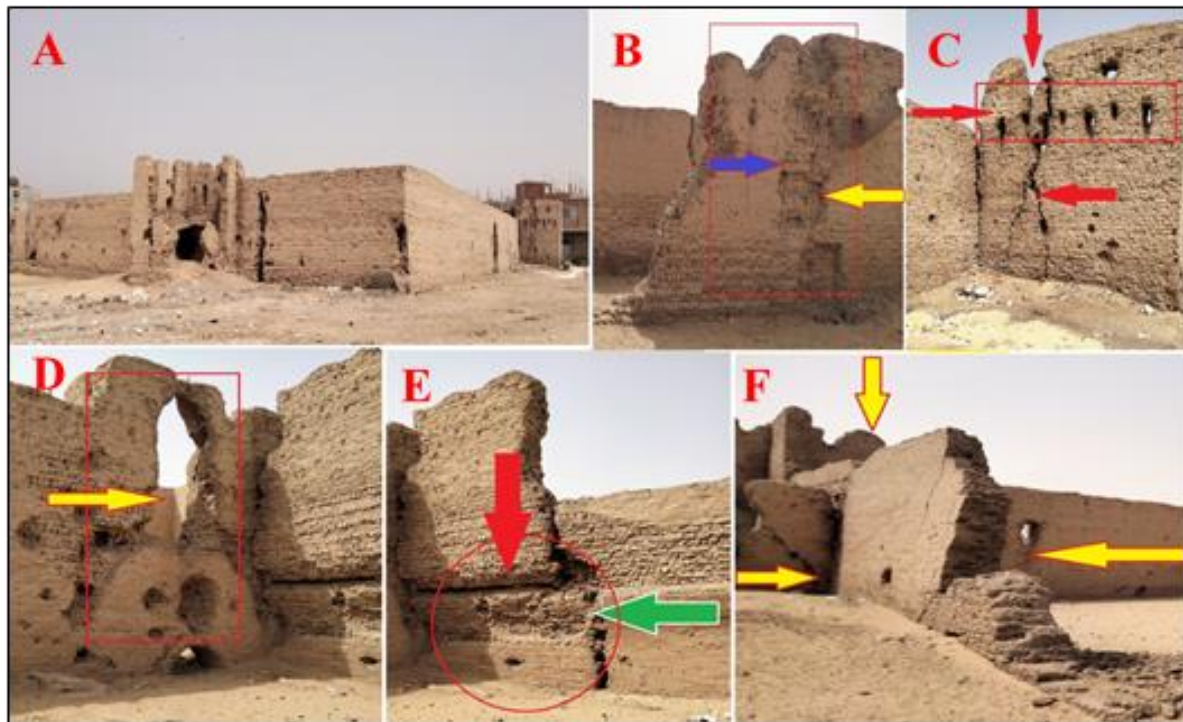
A. Shows the western façade of the citadel. B. loose parts of the wall. C. fissures in along the wall (western tower). D. loose parts of the wall due man-made deterioration. E. Partial collapse and separation in the wall. F. loose parts and slanting in the wall.
